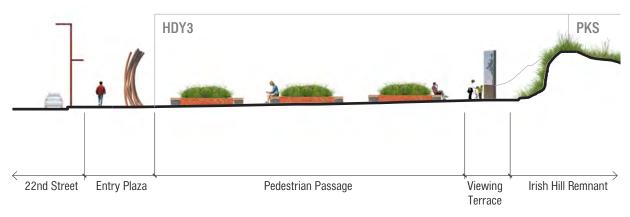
Illustrative Irish Hill Corner Plaza Section Note: All dimensions and elevations are illustrative only.
